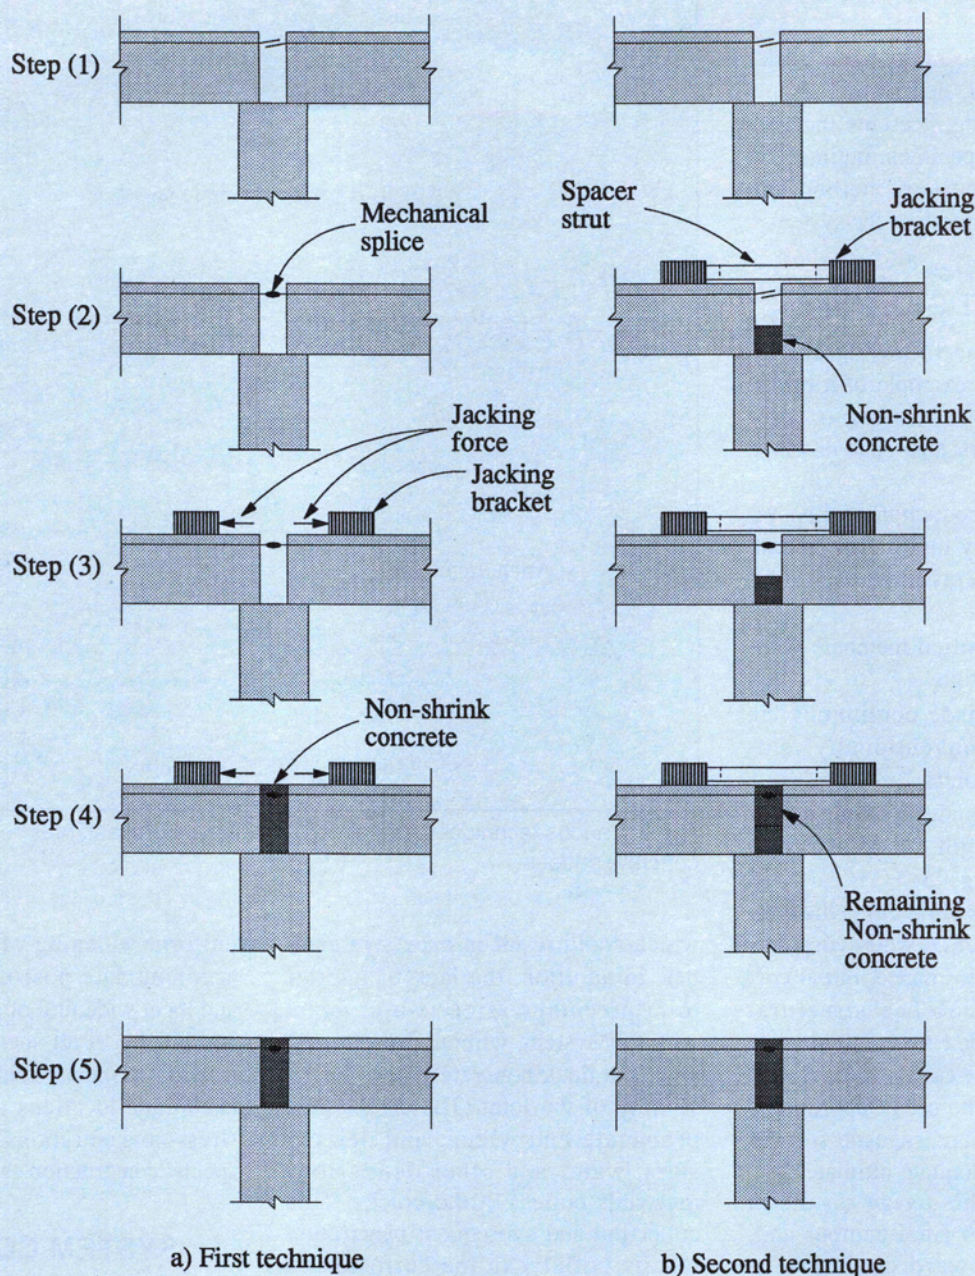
Two equivalent techniques for splicing precast, prestressed concrete girders.
